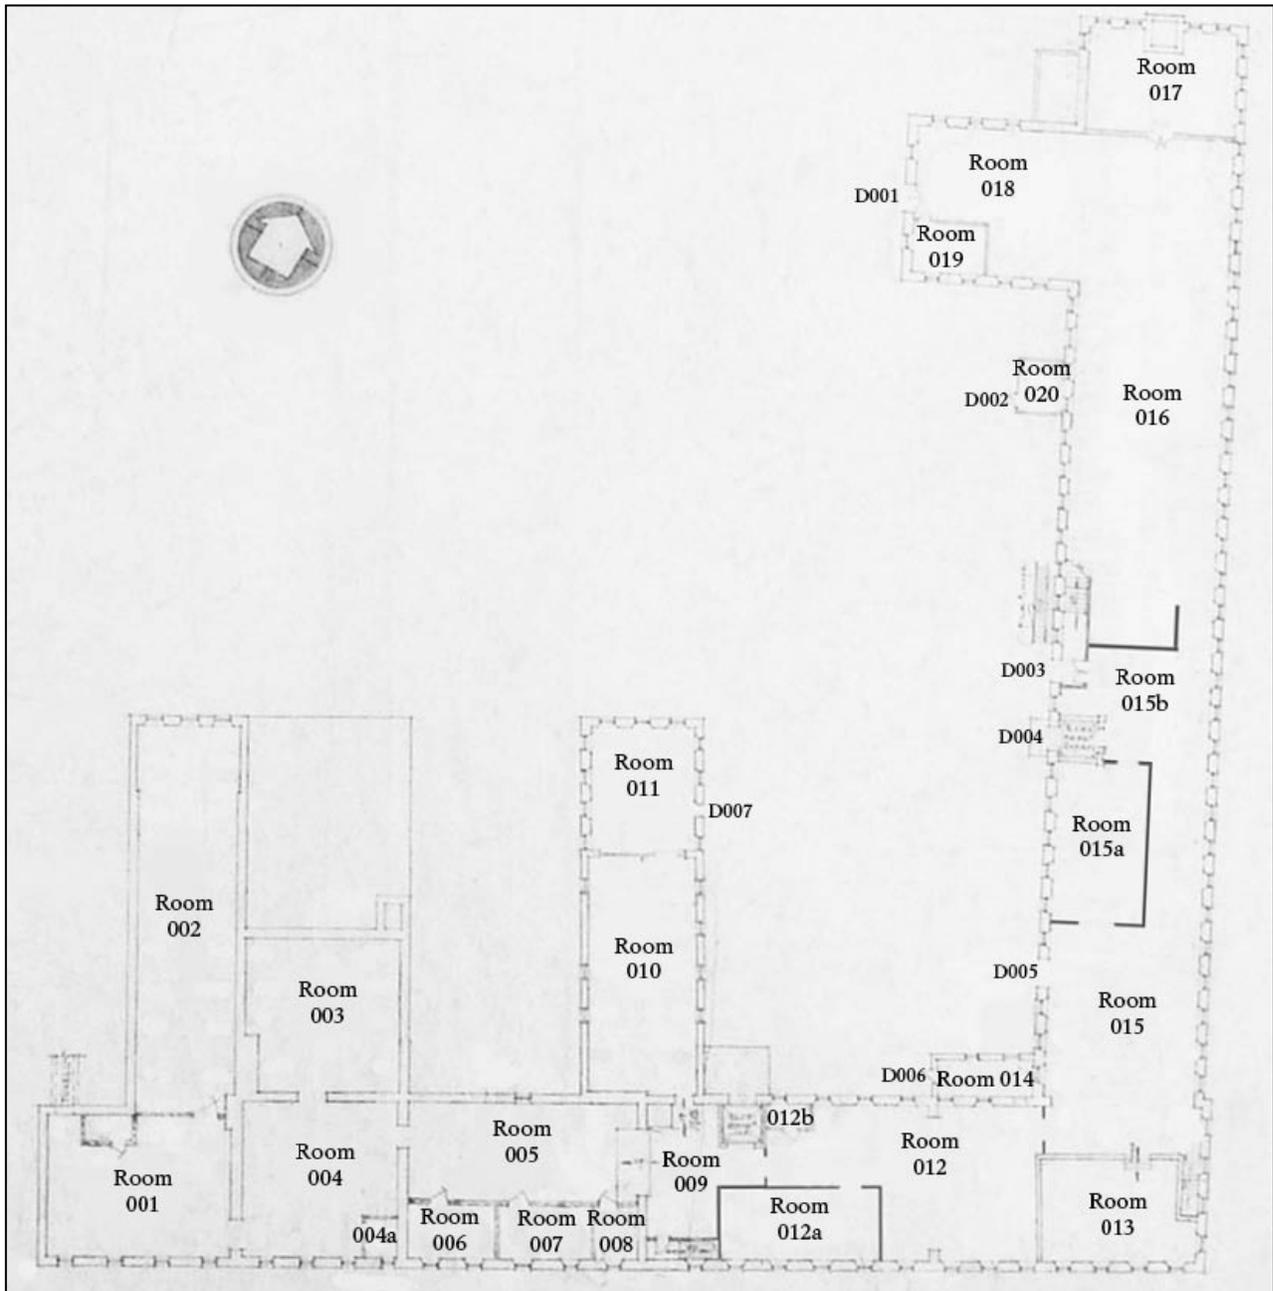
Building 27 basement floor plan, with room numbers assigned for current project. Plan copied from 1941 drawing (fig. 53) with more recent partitions added; not to scale.
